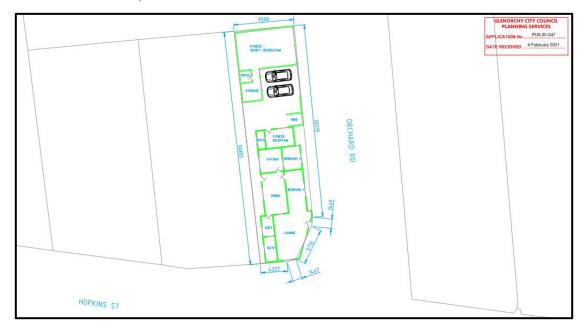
Site plan for 94 Hopkins Street, Moonah.
